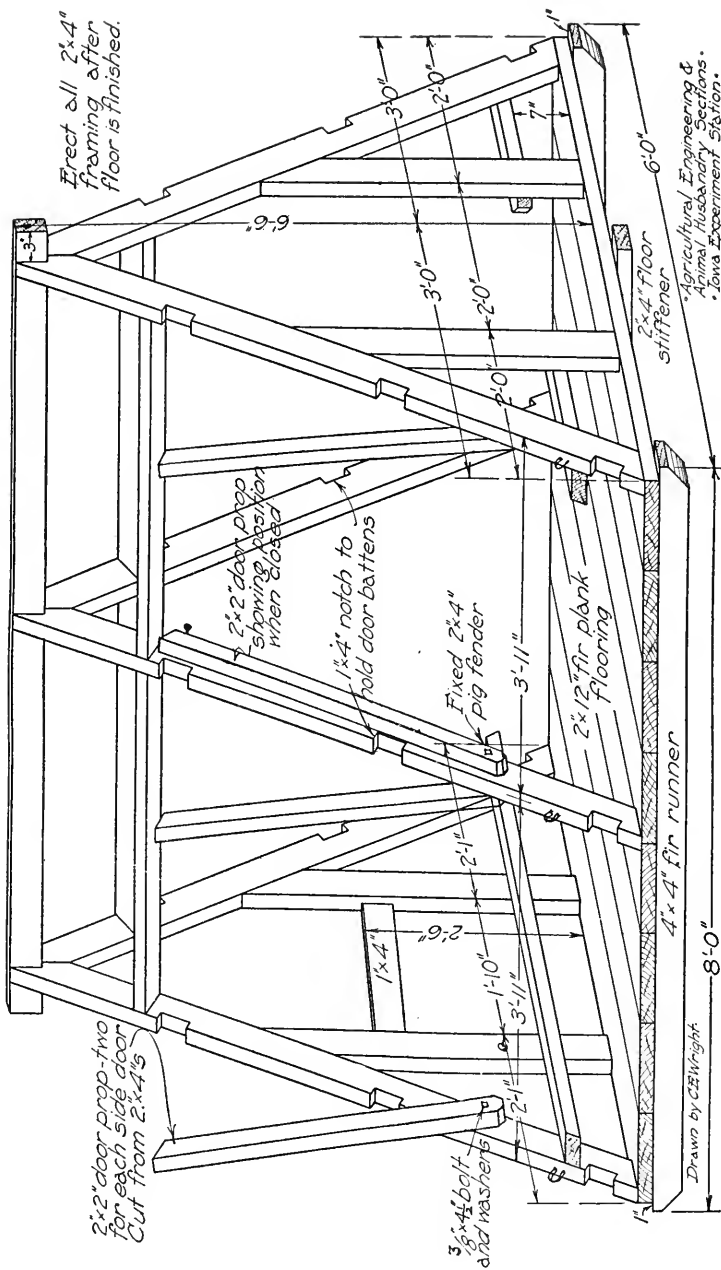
"A" House (Doors Hinged at Top). Perspective showing framing details.
